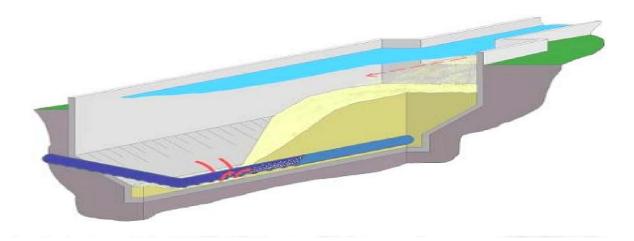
b The tunnel sand trap equipped with two Slotted Pipe Sediment Sluicer (SPSSs) (Source: GTO Sediment AS - Olav Tryggvasonsgt. 24b)
